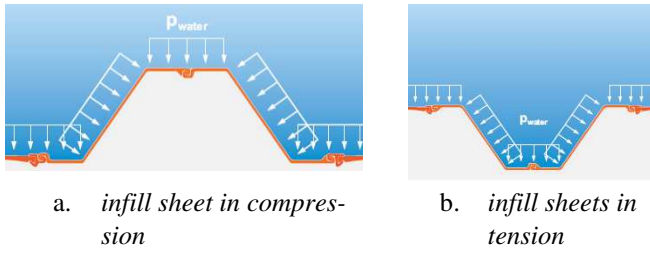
HZ[®]-M wall under water pressure (ArcelorMittal Sheet Piling, 2020)
